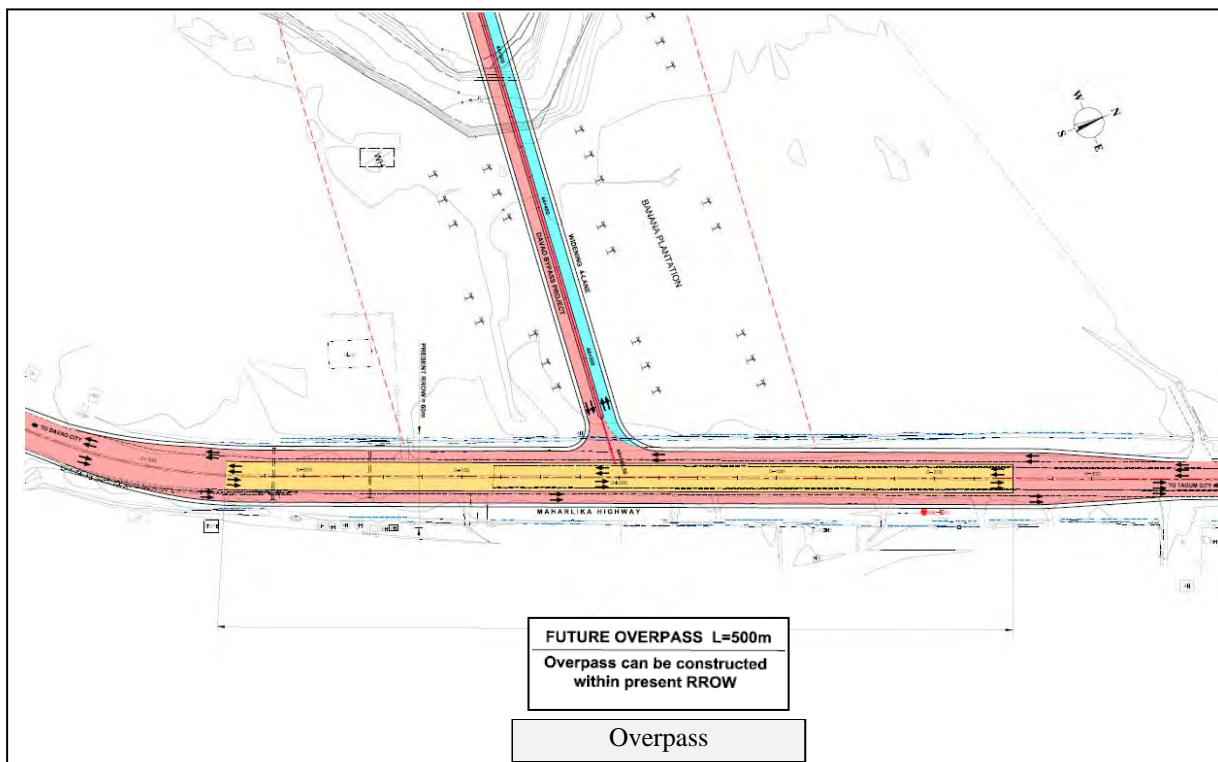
(2) INTERSECTION OF DAVAO-GENERAL SANTOS ROAD (0+000) (WIDENING STAGE)
